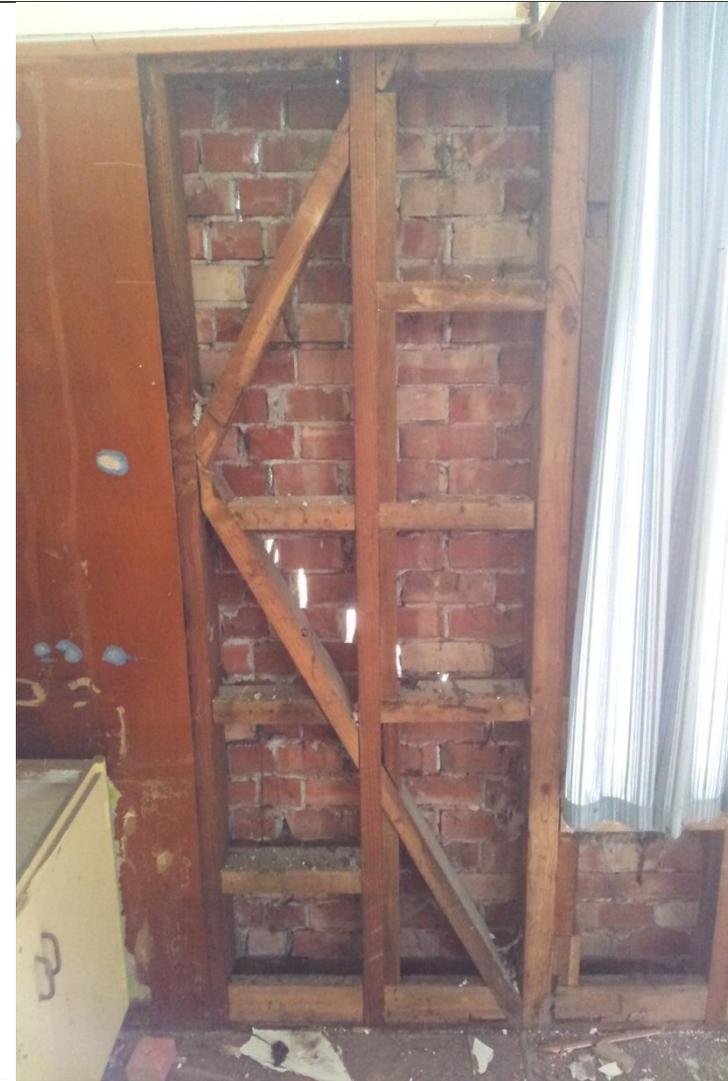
Wall bracing in panels on the north wall (longitudinal test)
